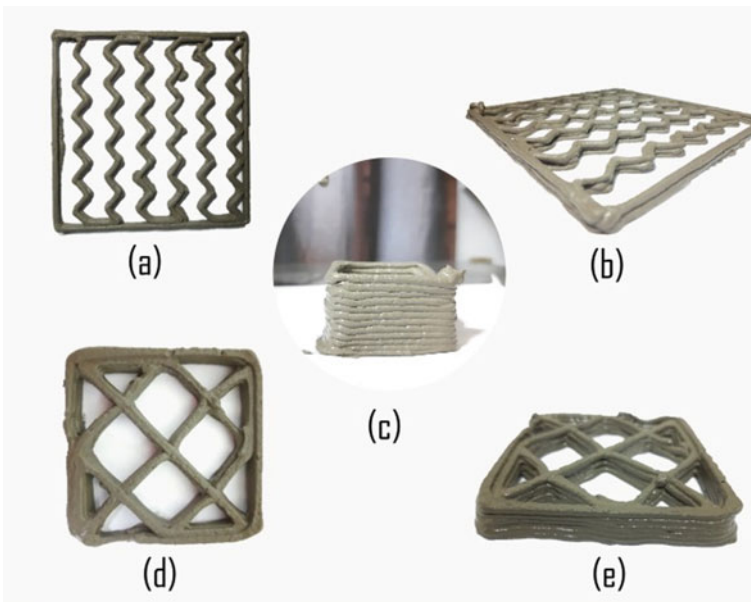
3D printed shapes; a square (10 cm × 10 cm × 1 cm) filled with wedge shape-top view, b square (10 cm × 10 cm × 1 cm) filled with wedge shape-isometric view, c square 5 cm × 5 cm × 4 cm with no infill, d square (10 cm × 10 cm × 1 cm) with grid shape infill-top view, e square (10 cm × 10 cm × 1 cm) with grid shape infill-isometric view
